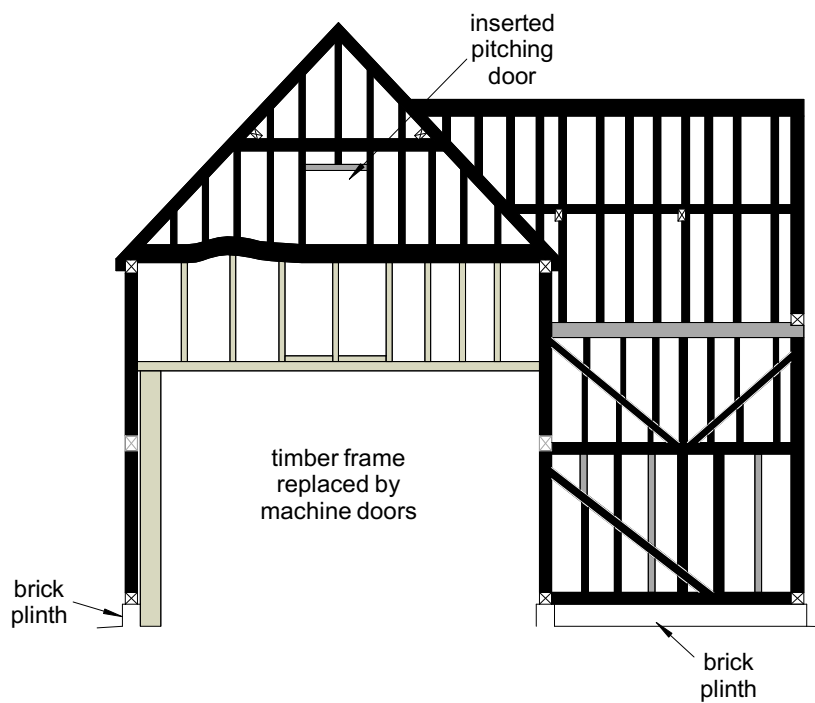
Frame drawing of the north-east wall to the Church Barn, indicating the locations of original, re-used and replacement timbers.
